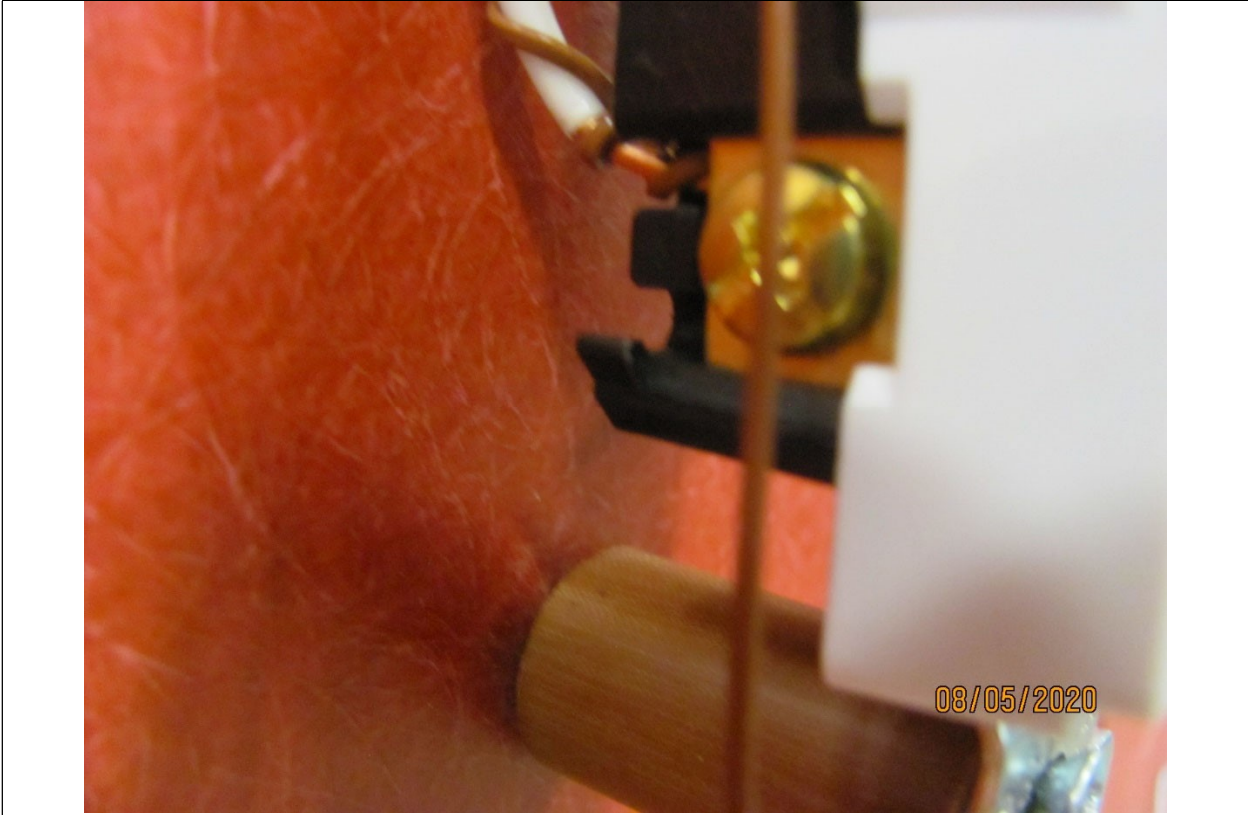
Typical Installation of Receptacle Since Conductor Back Wired
